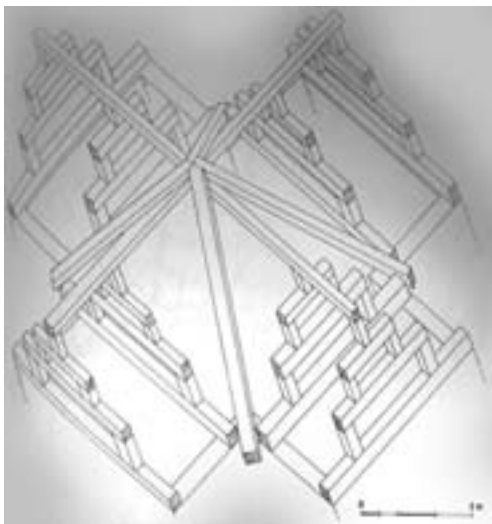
Reconstruction of the beamwork covering a building of cruciform plan
